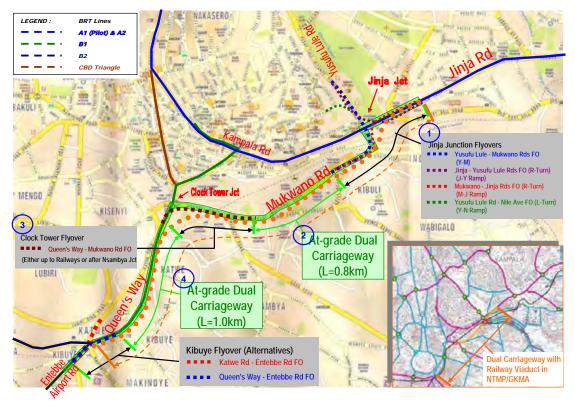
Alternative Plan for Dual Carriageway with Railway Viaduct Plan
